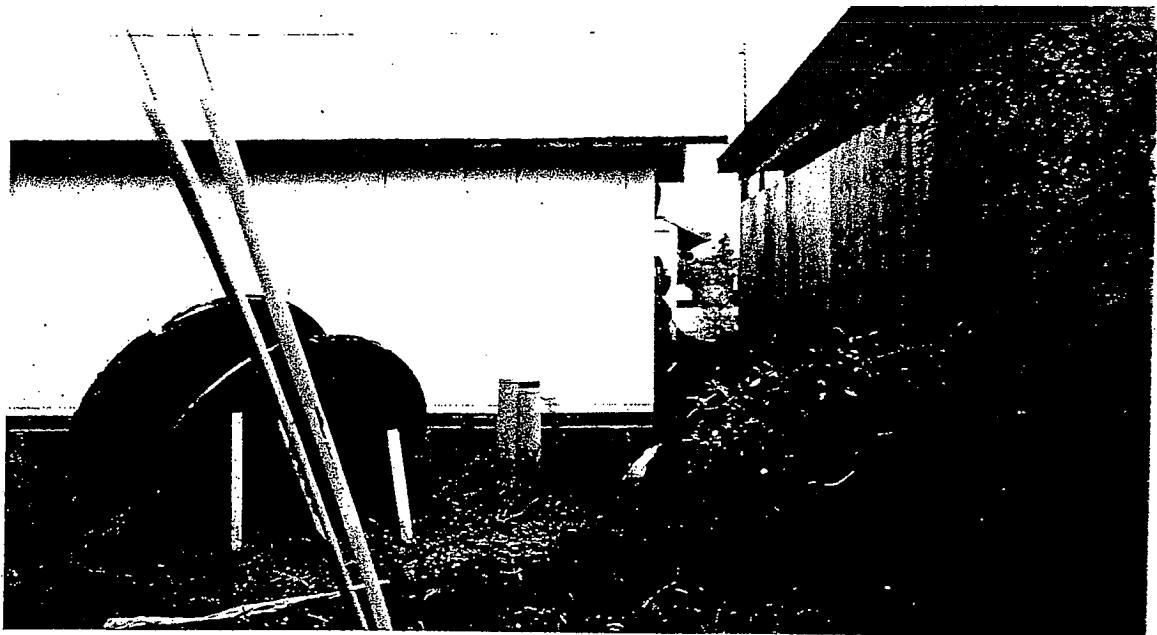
Contaminated Trench Area Between GTE Storage Building and BJ Fuel Pole Barn
